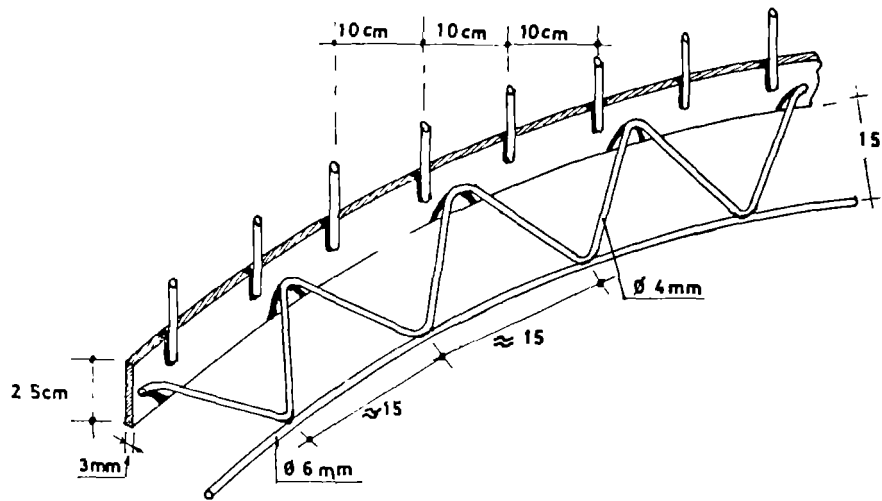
DETAIL OF RING SEGMENT WITH STEEL PINS.
